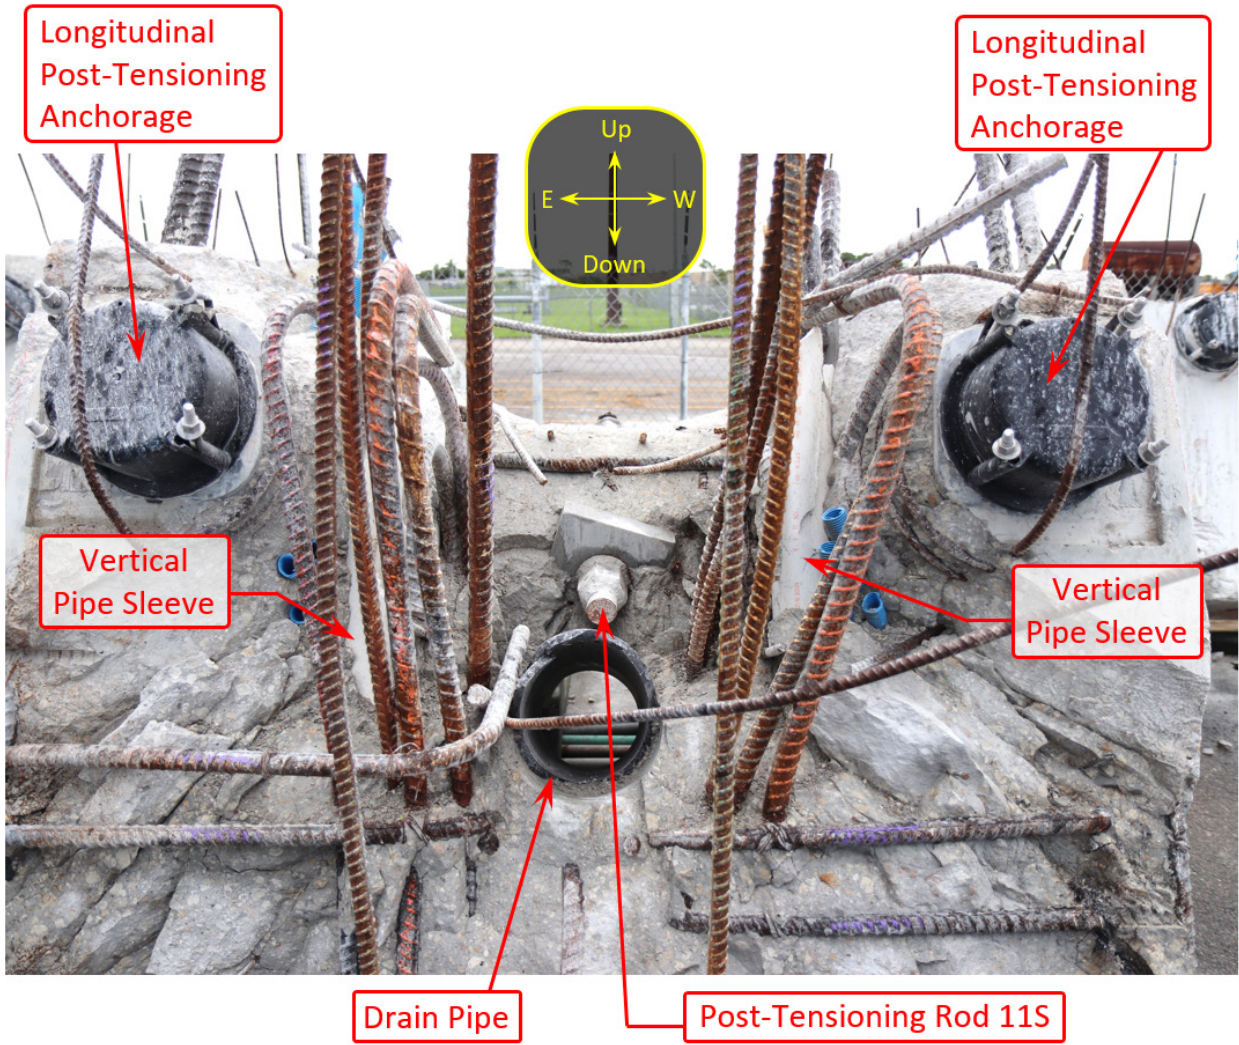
Photograph showing post-collapse condition of deck portion of truss member 11 and 12 nodal region looking from north toward south along bridge centerline.
